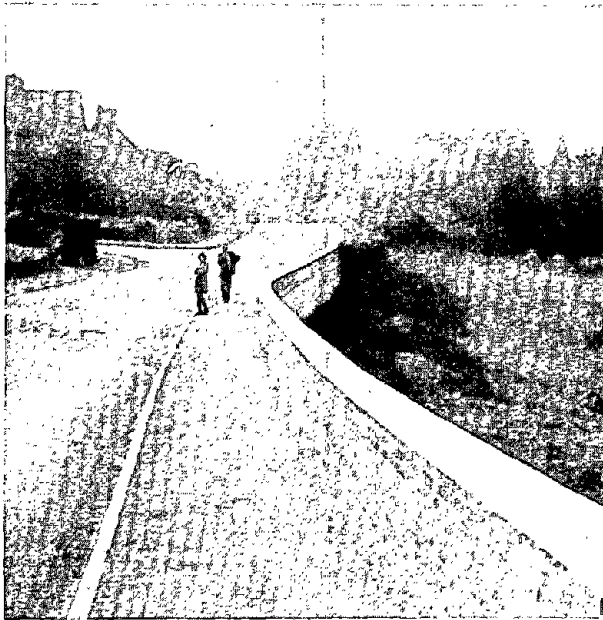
Completed fly ash backfill behind retaining wall at Bidborough, Kent, England.
